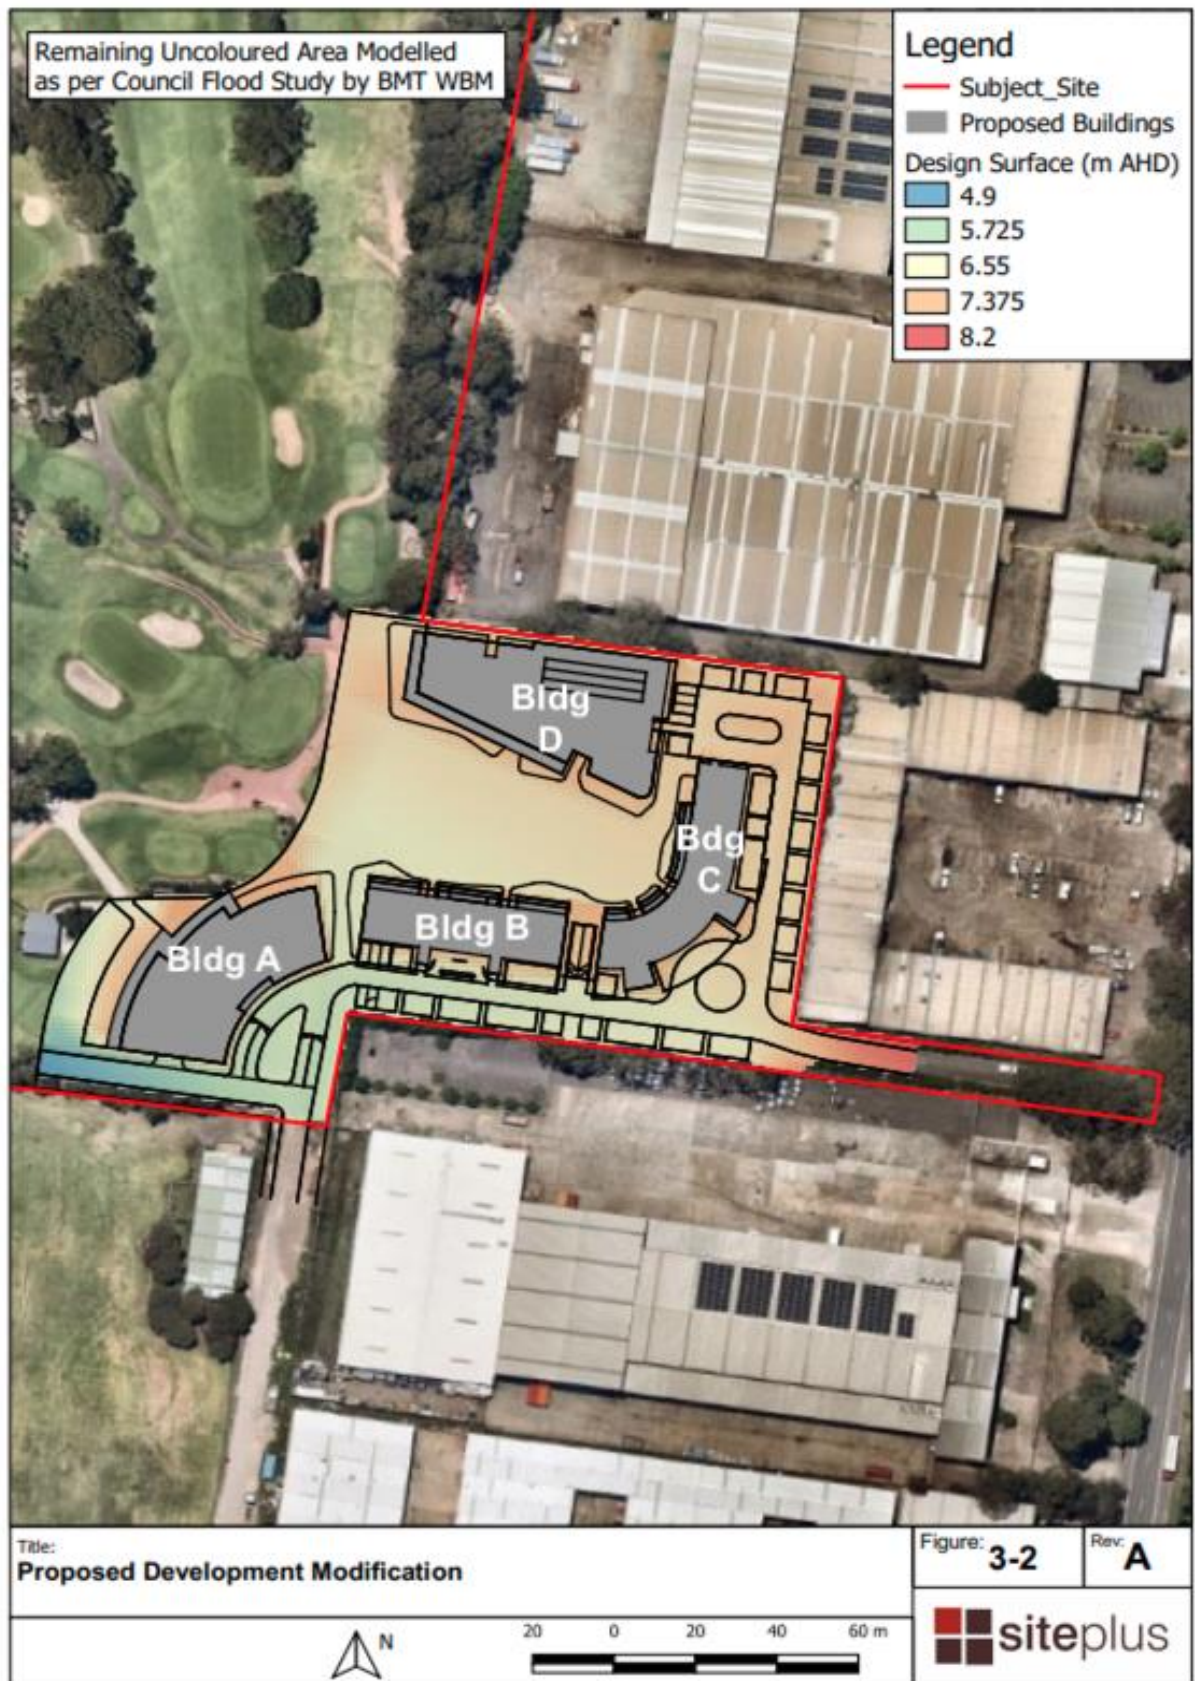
Proposed development design surface (source: Site Plus, 2021)
